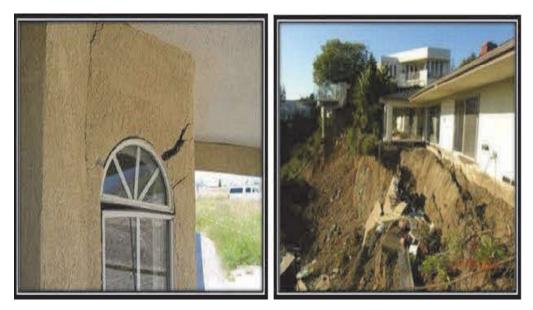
Structural failures of buildings which are constructed on gypseous soil (after Abid-Awn, 2010)
